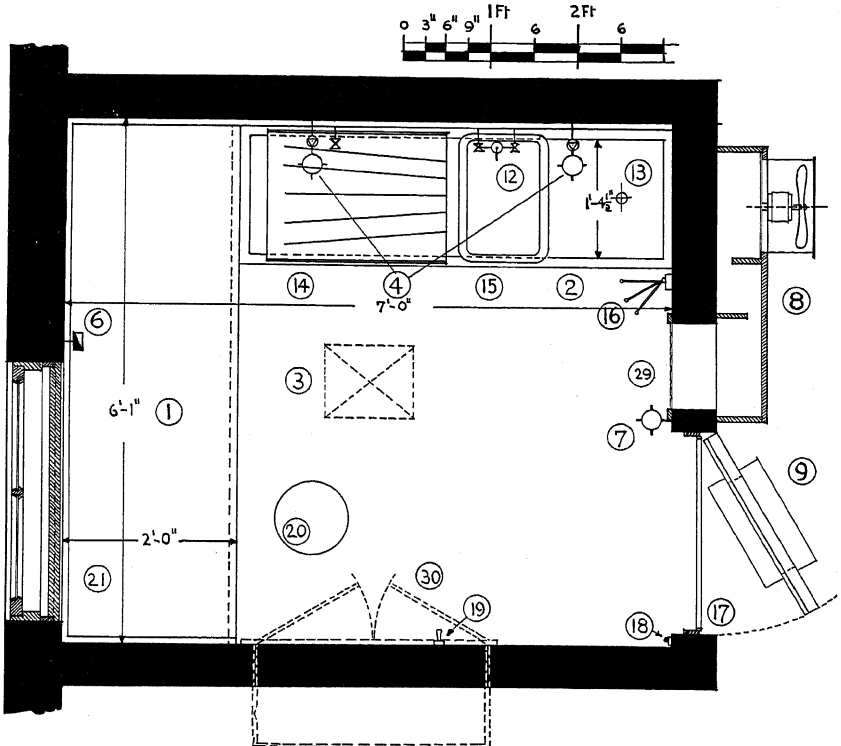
Plan of Lee Parsons Davis' model darkroom
